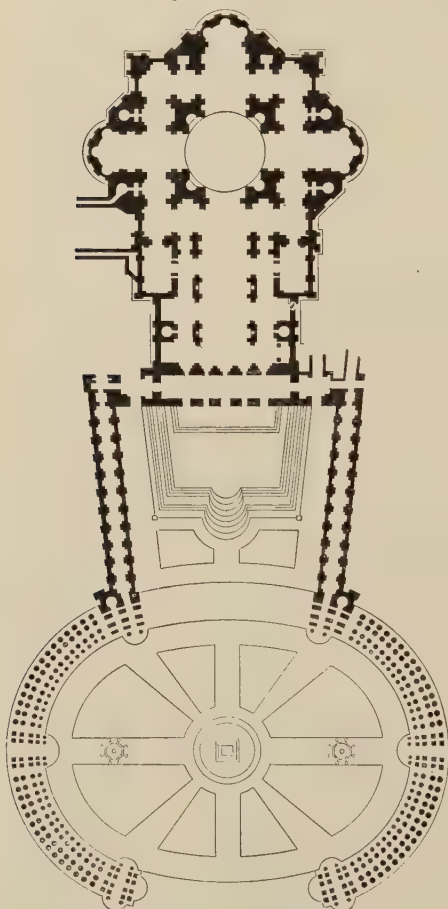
PLAN OF PIAZZA OF ST. PETER'S, ROME
